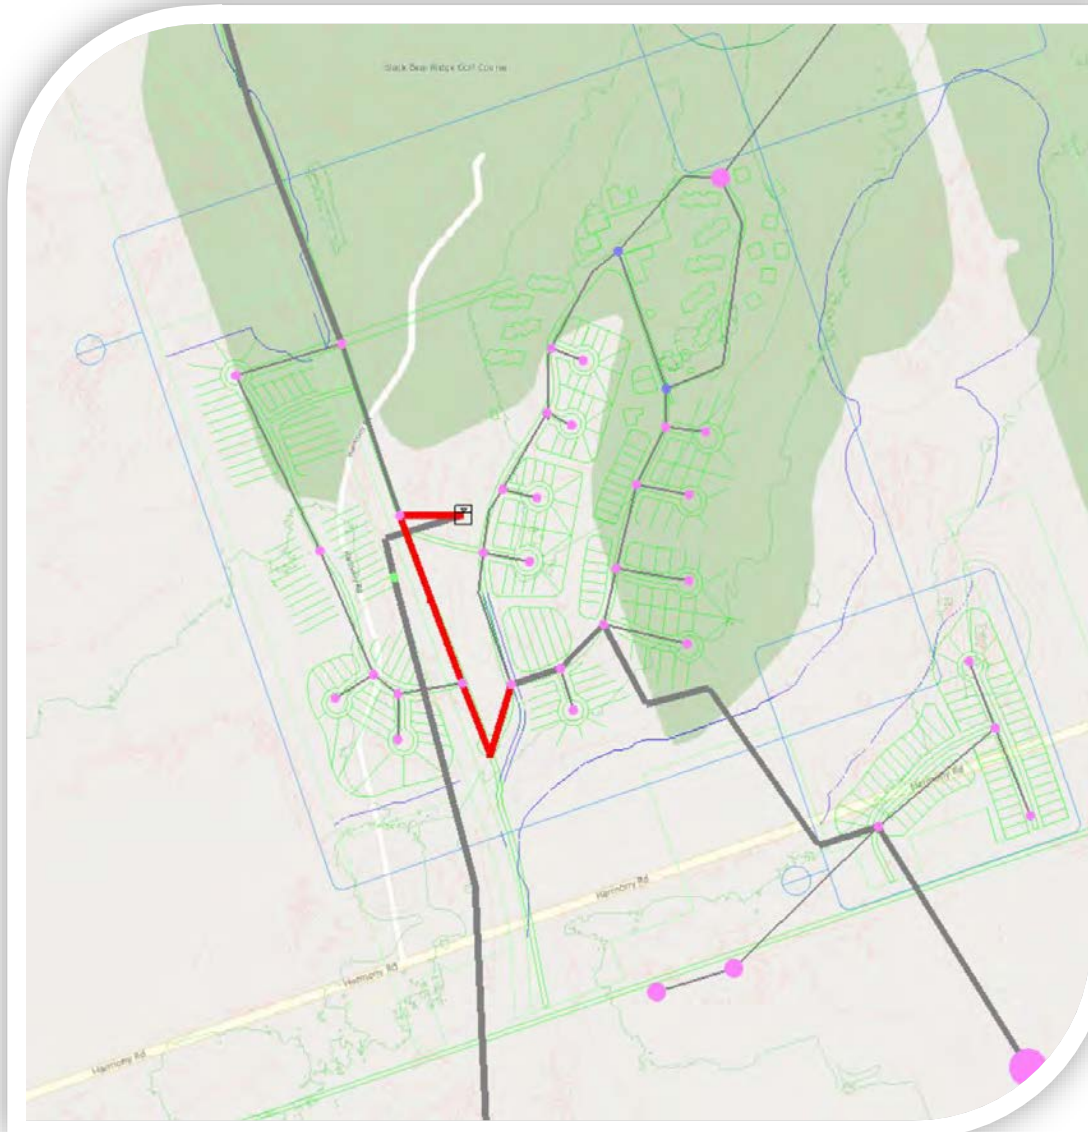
Hydraulic Model Representation of 300 mm Elevated Storage Outlet Through South Development Area (Red Highlight)
